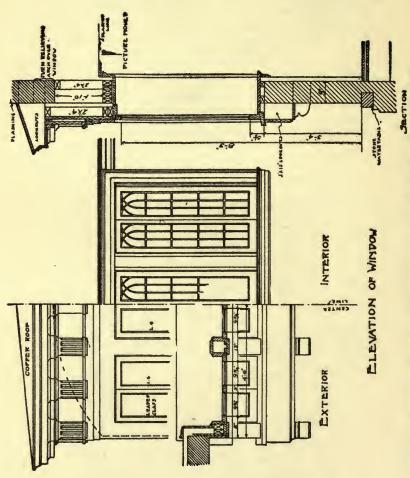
Showing Details of Construction for Projecting Bay Window.
